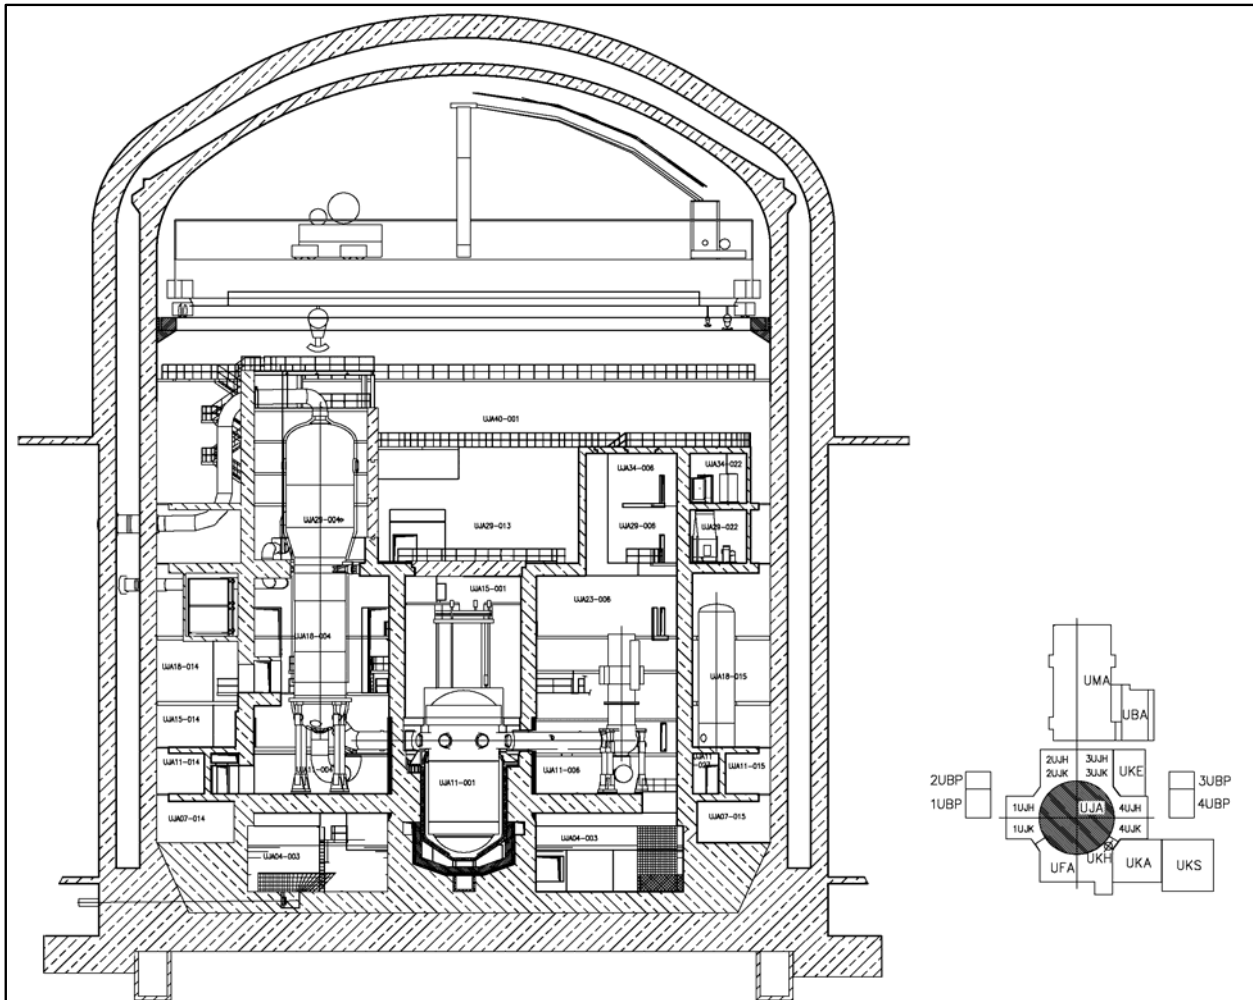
8: REACTOR BUILDING SECTION B-B
